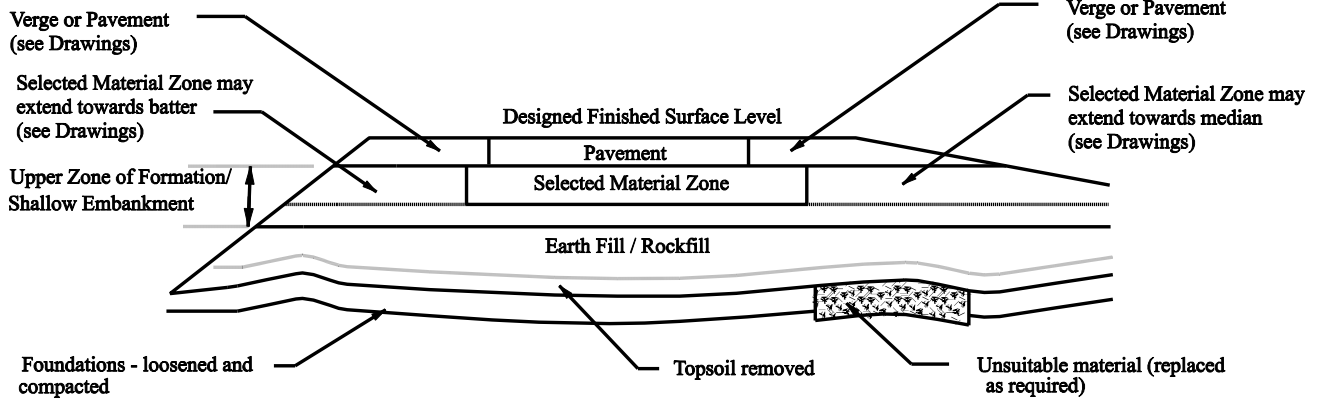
(a) – Embankment Foundation Treatment – Type E1
